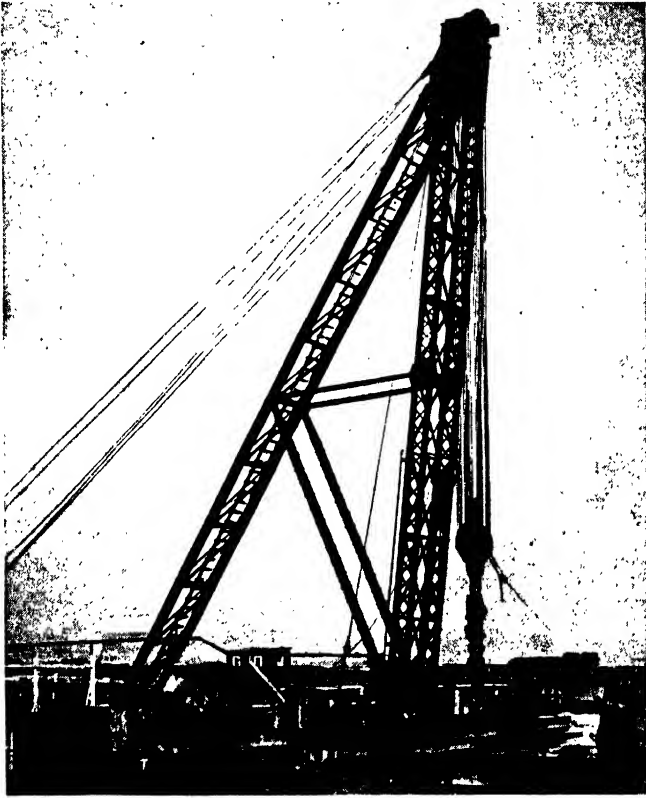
Barge-mounted heavy-duty pile extractor.
